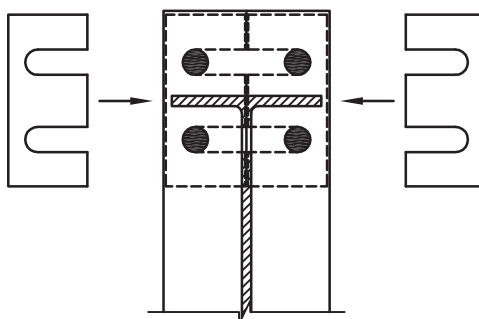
SHIMS USED BETWEEN END PLATE AND COLUMN FLANGE (after Ref. 6)
